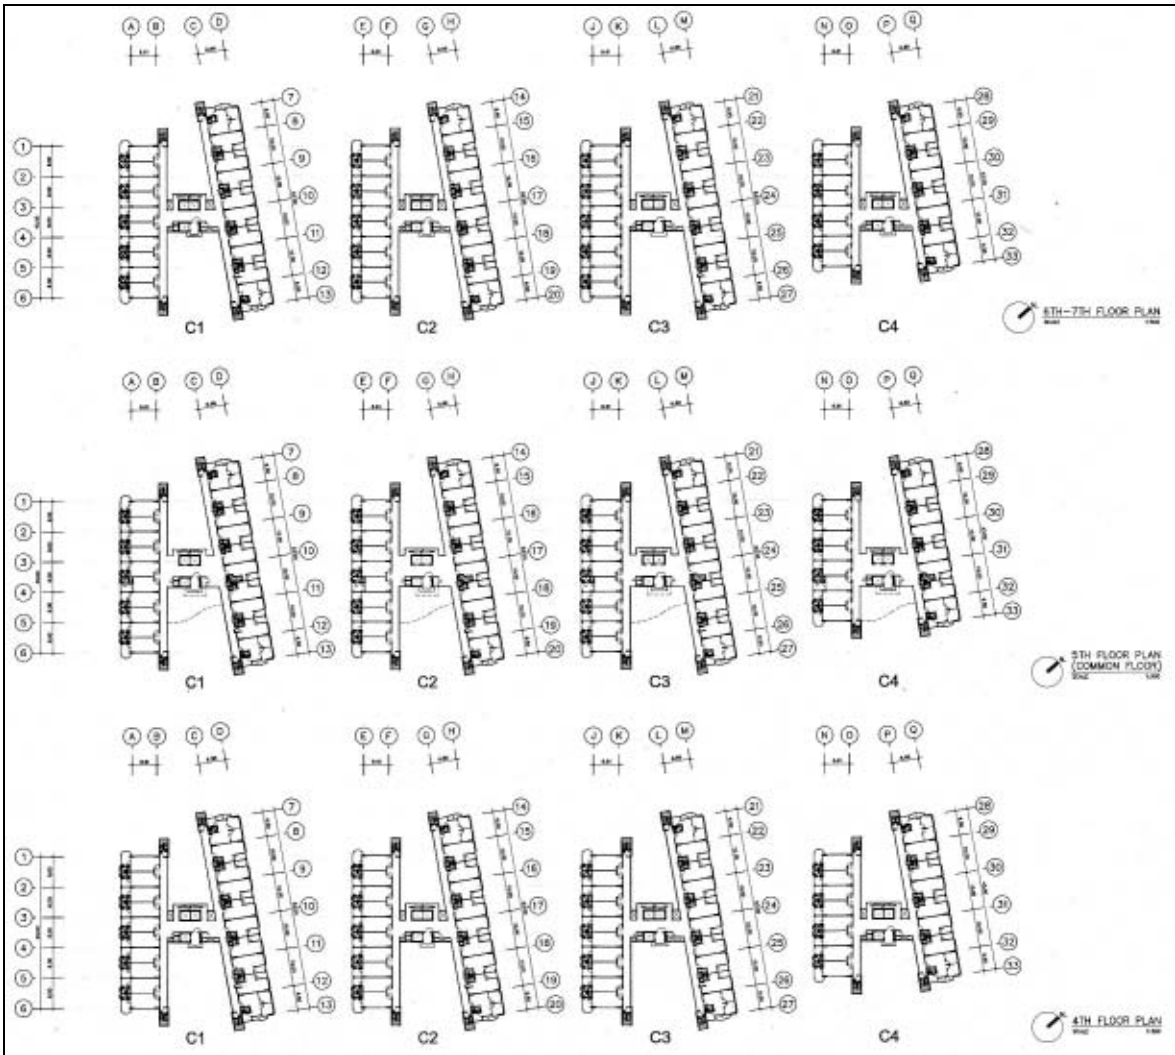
Building Layout Plan at Site-C (4TH Floor ~ 7TH Floor)
